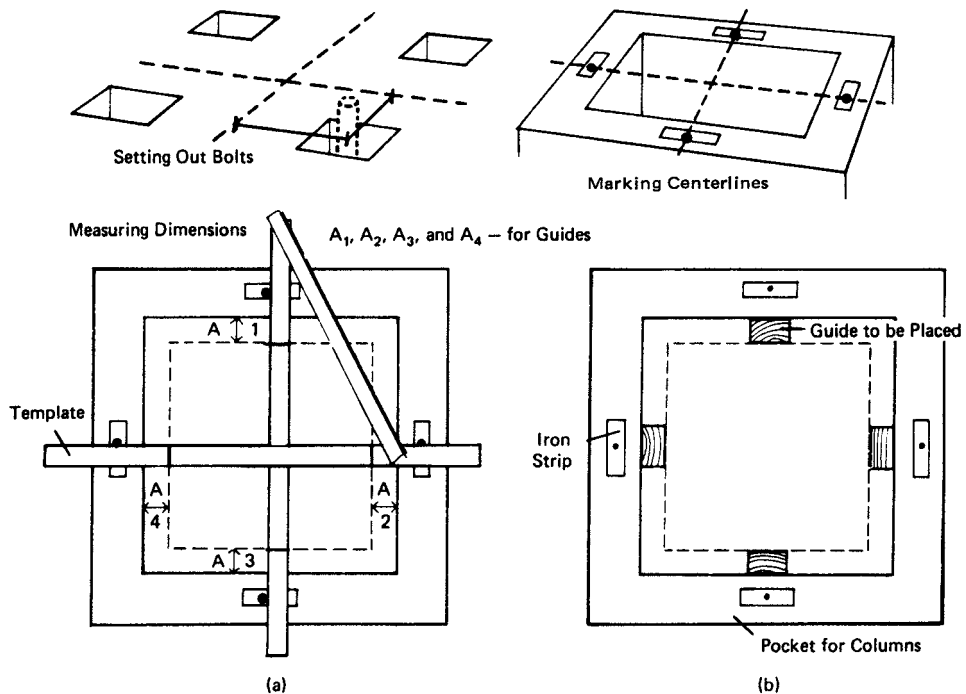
Connections of columns to footings. (a) Bolt connection. (b) Pocket connection. (Courtesy of National Swedish Institute for Building Research, FIG Report 69)
